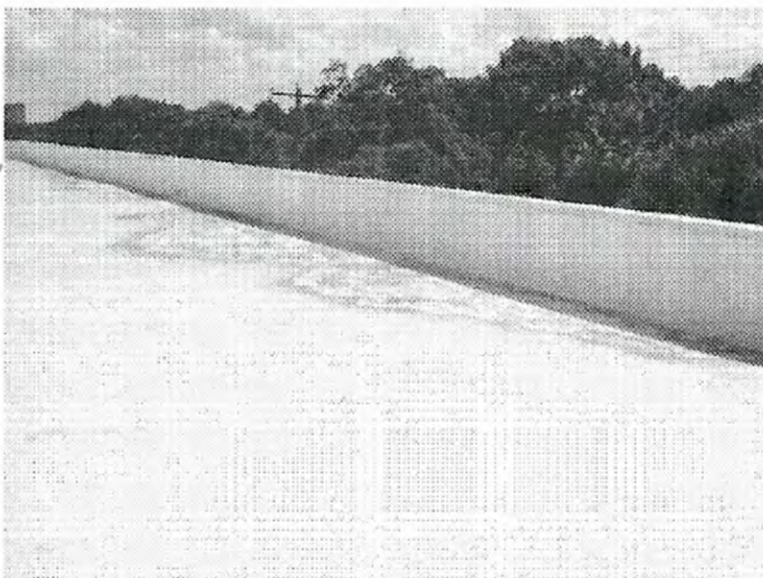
Large area of apparent ponding water on eastern portion of roof over Building C.
